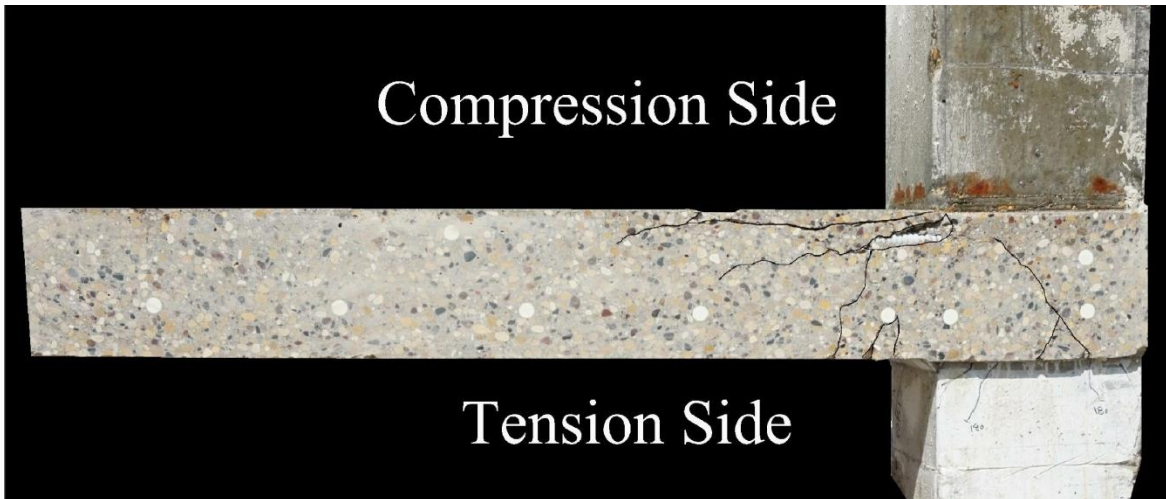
Cracking on the tension face at failure for Series IV connections
